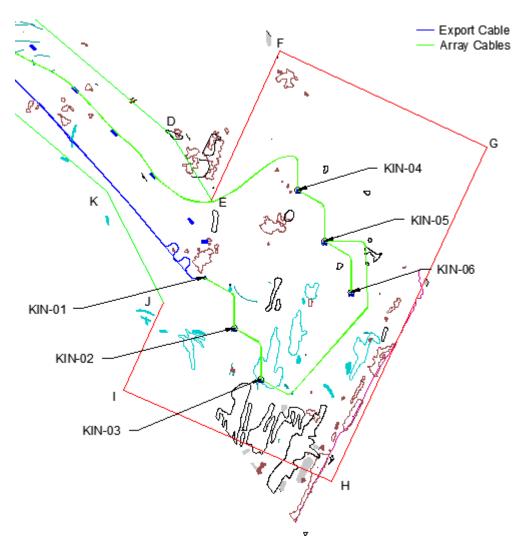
2MW and five 9.5MW turbine final layout plan showing spacing between the turbines
